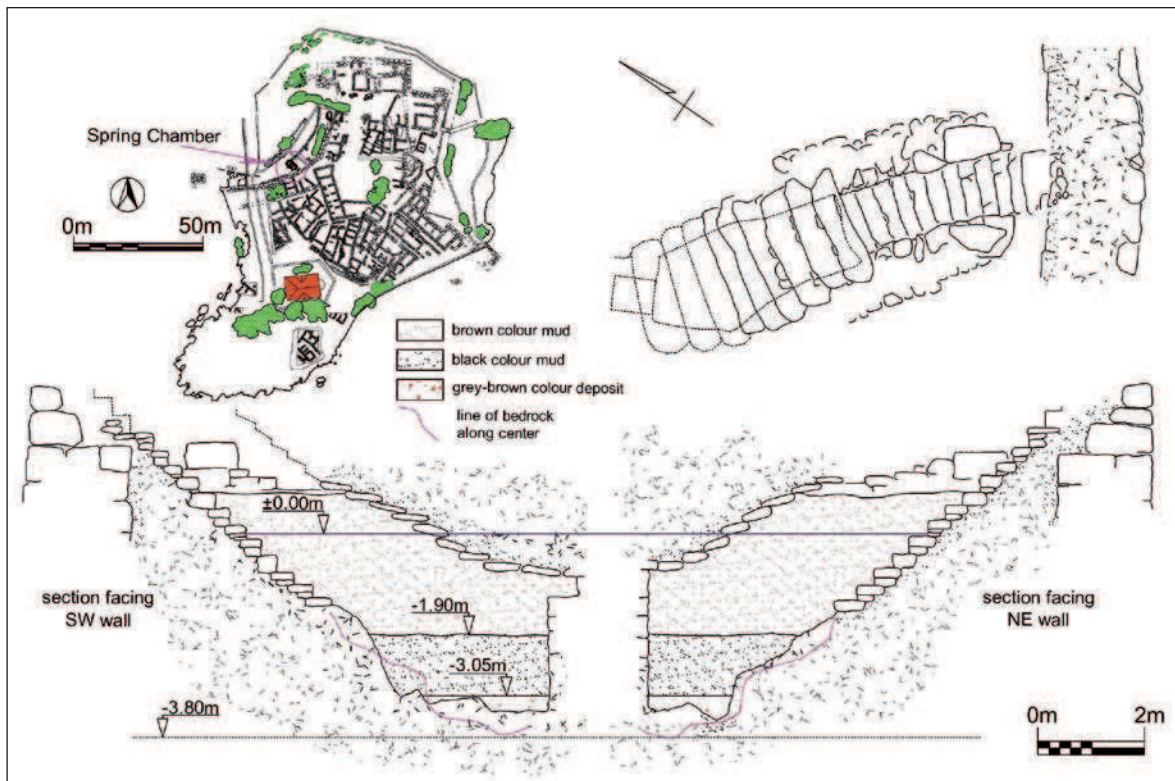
Location, plan, and cross-sections of the Spring Chamber (modified after Caskey, 1971).
